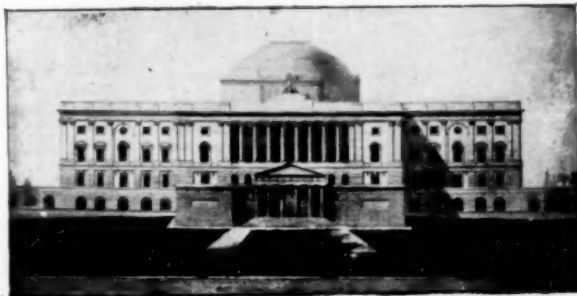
West Elevation: Drawing by Latrobe, 1811.
